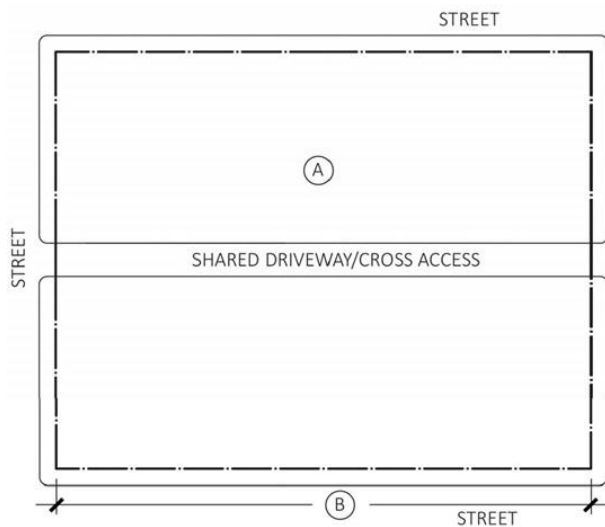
Example: Retail Building Facing Becker Road or Port St. Lucie Boulevard.
